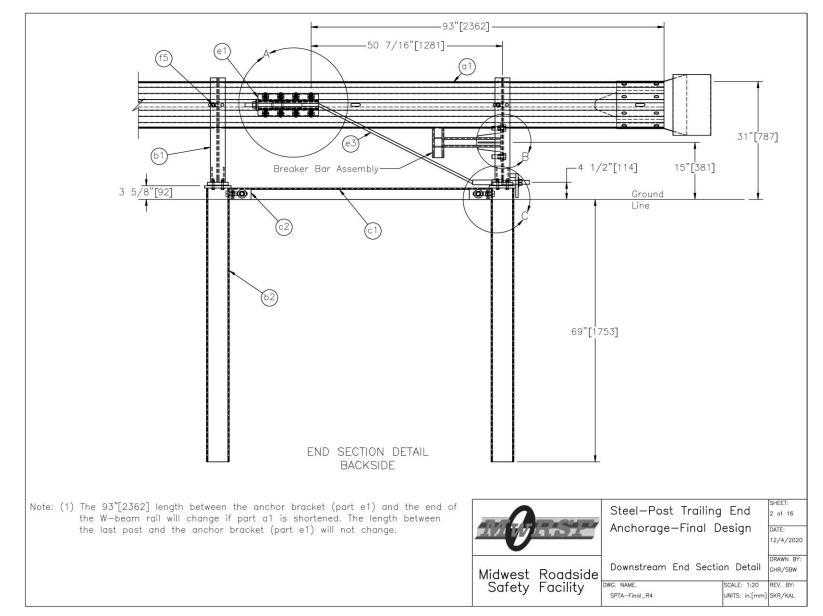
Steel-Post Trailing End Anchorage, Downstream End Section Detail
